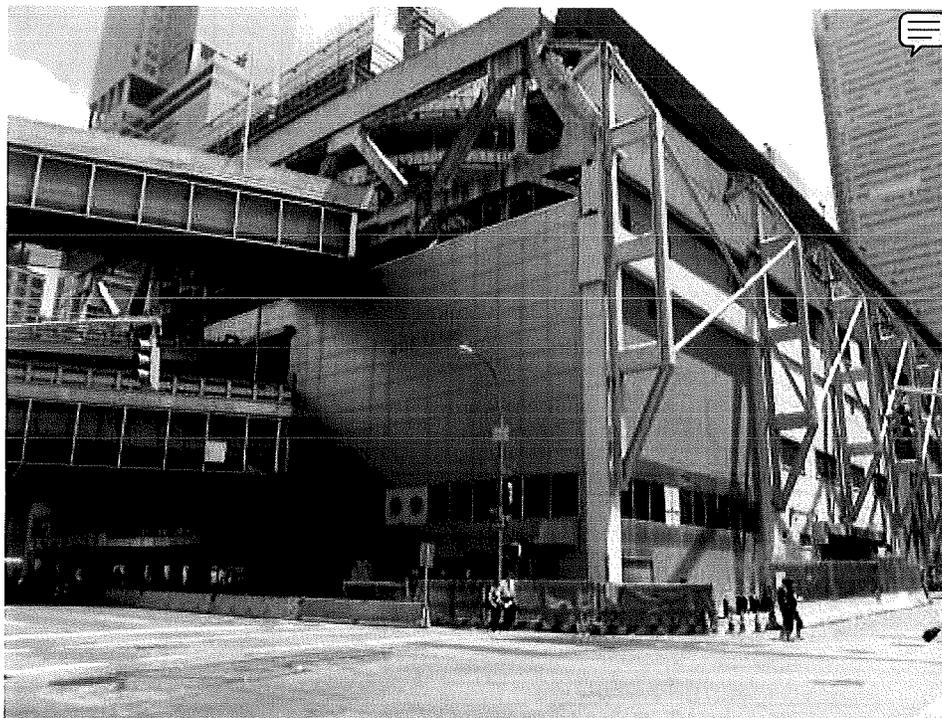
Southwest elevation of the Port Authority Bus Terminal. Note the steel framing for the seismic retrofit.
